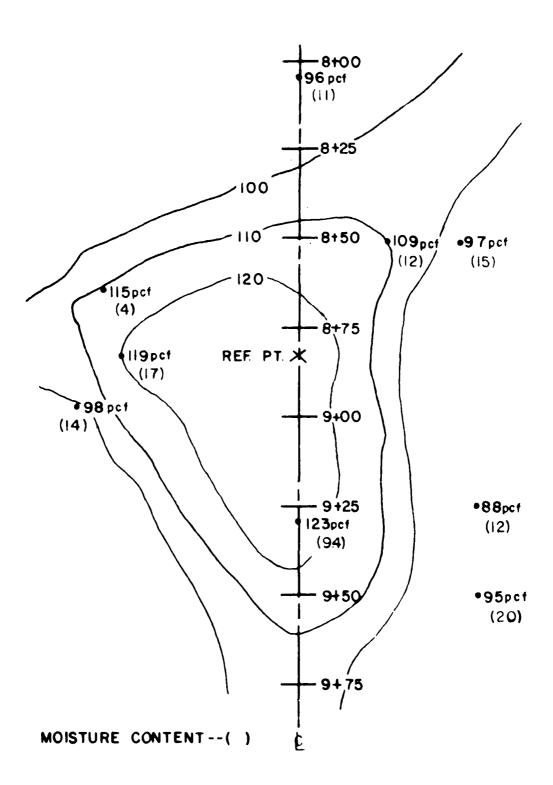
LAYOUT OF INITIAL DENSITIES IN BORROW AREA.
